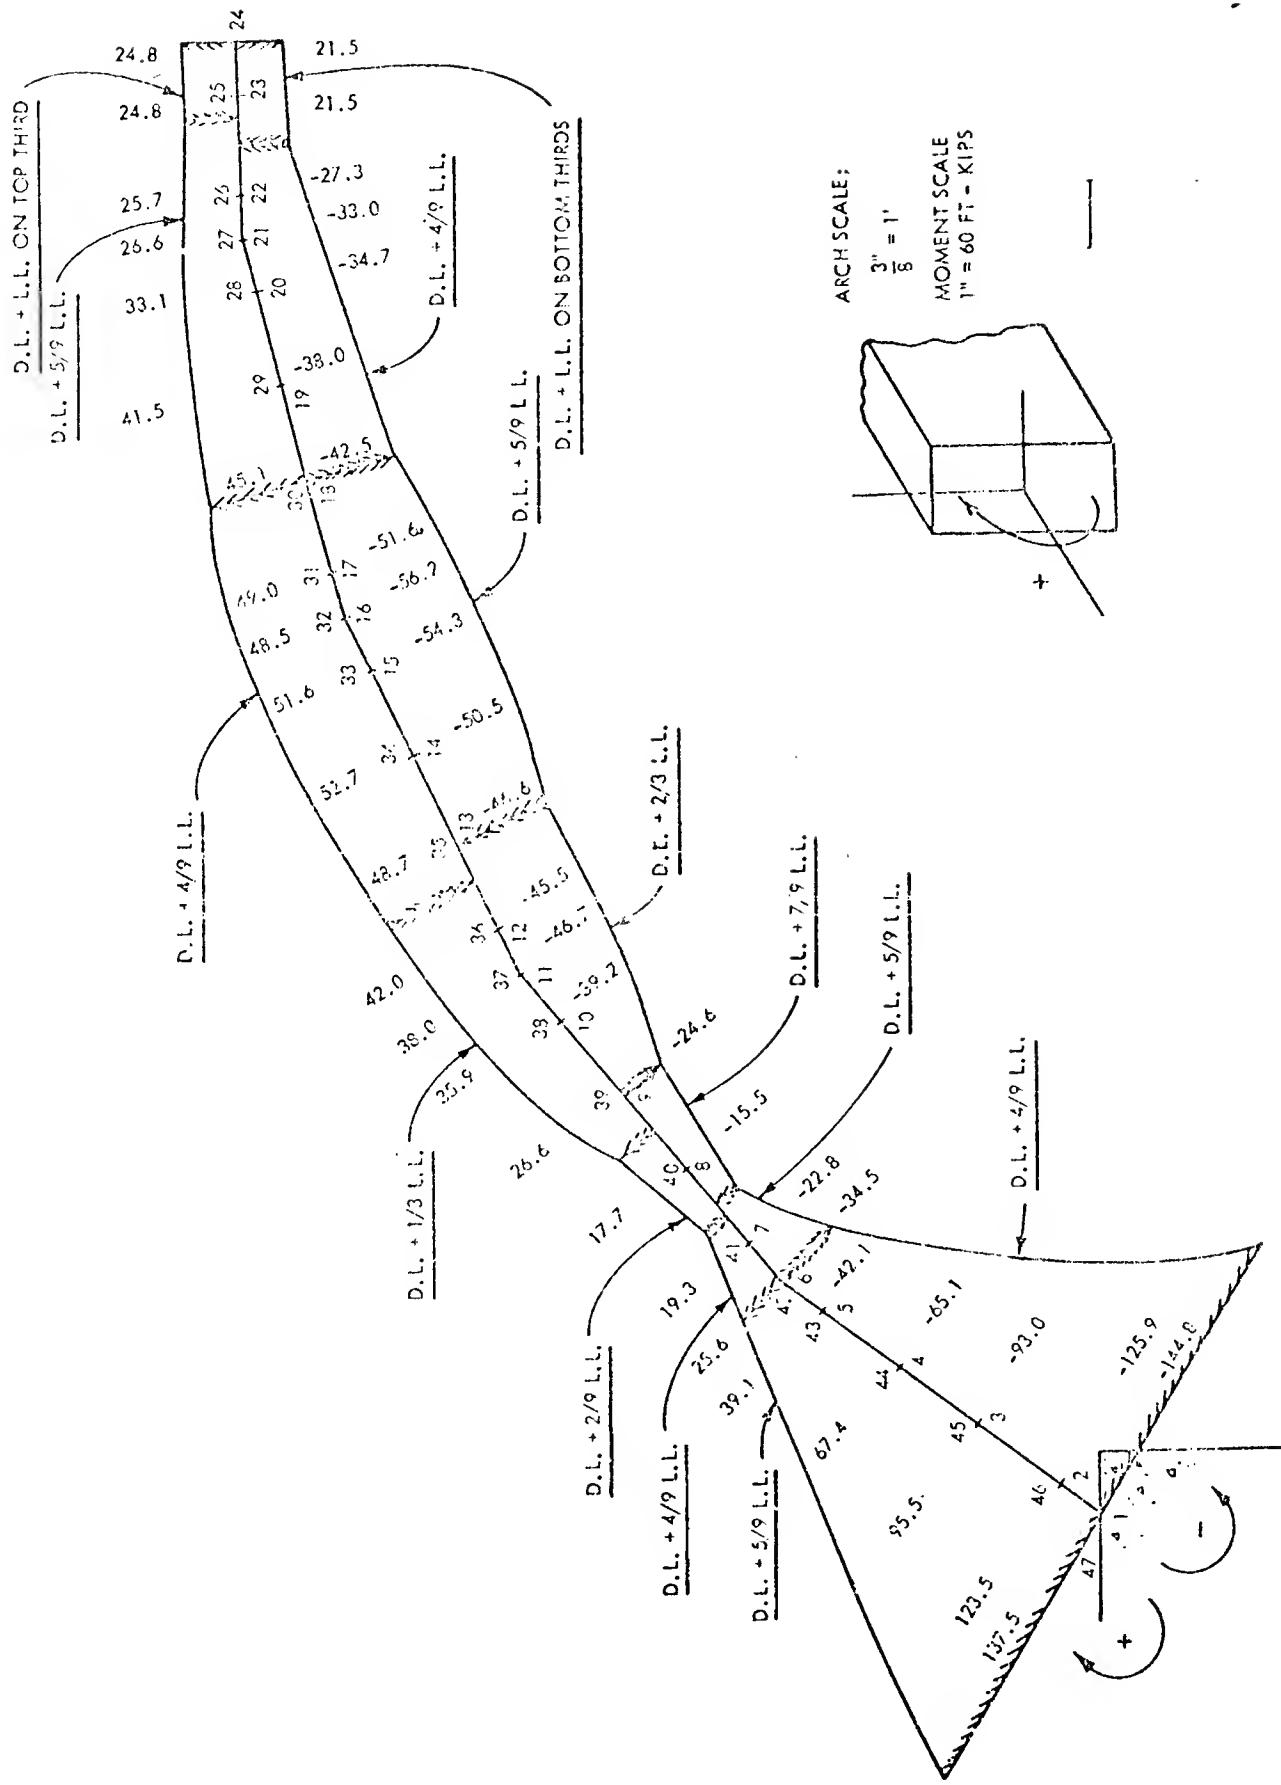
(Drawing) Final Design Moment Envelope for Stainless-Steel Arch of Oroville Power Plant Intake Structure
